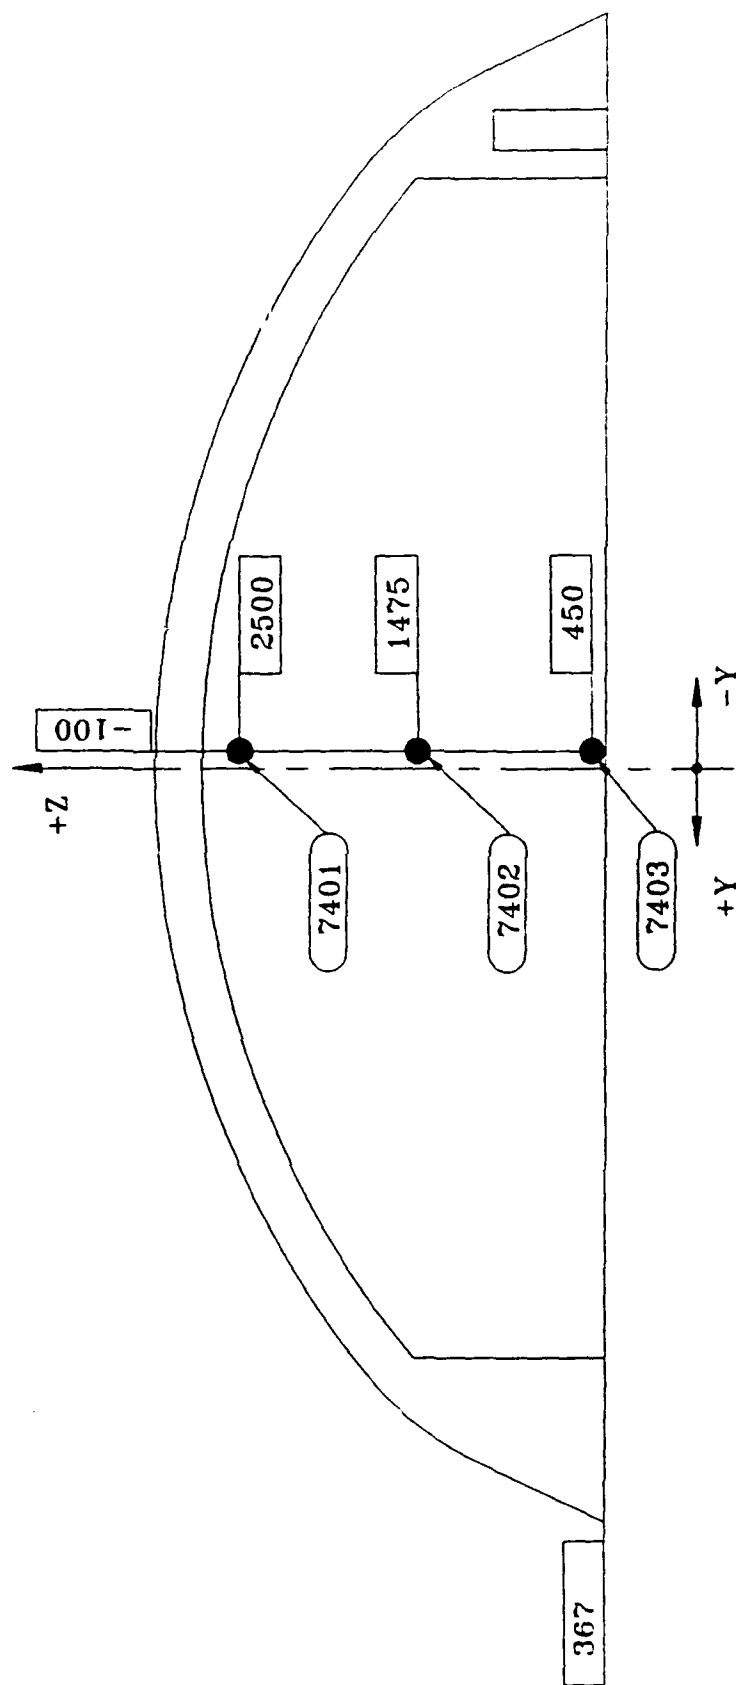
Instrumentation on outside of front door at $X = 415$, PAS-1.
